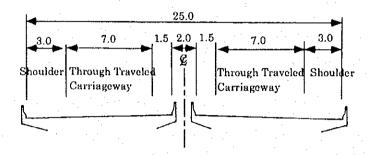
Typical Cross Section for Flyover and Waterway Bridges
